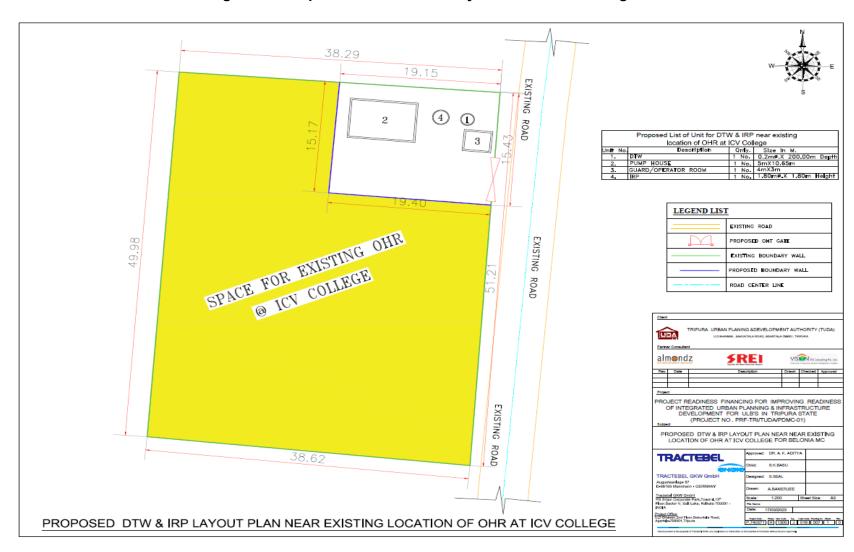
Proposed DTW with IRP layout Plan at ICV College
